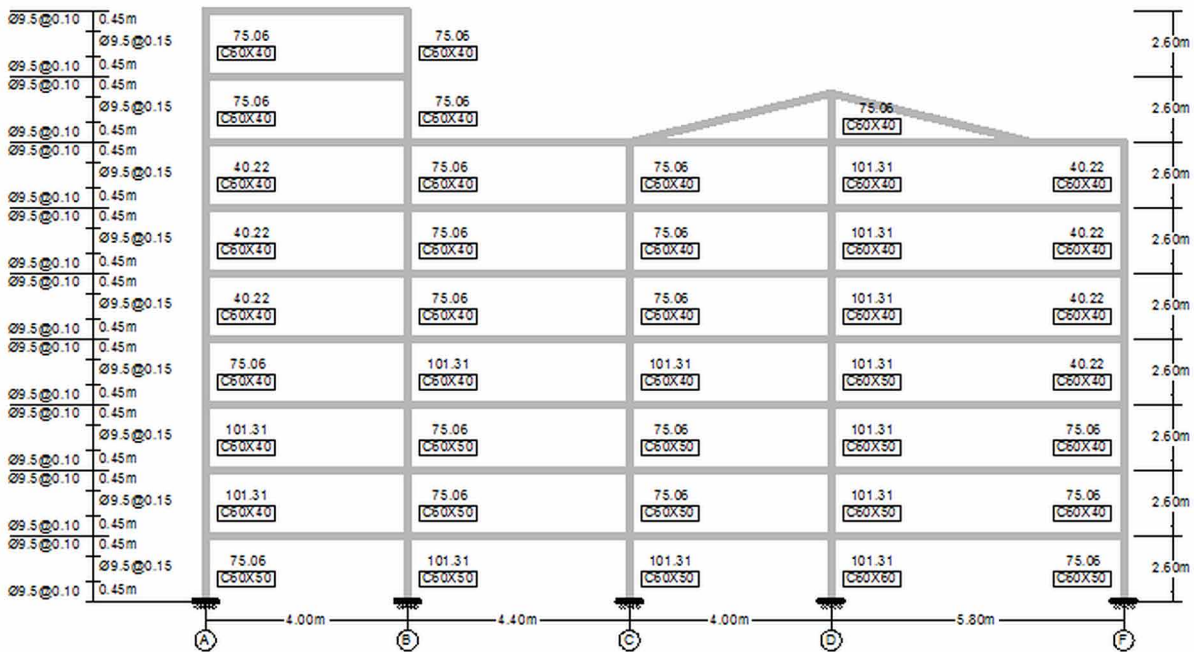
Residential building, geometry and reinforcement in columns of the frame 5
